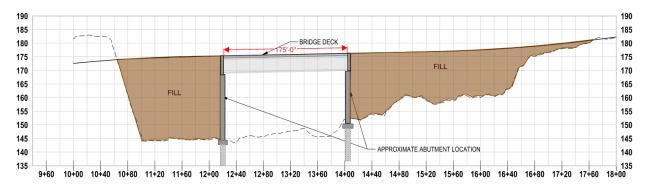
Option 1 - Single 175-Foot-Span Prestressed Concrete Girder Bridge Elevation
